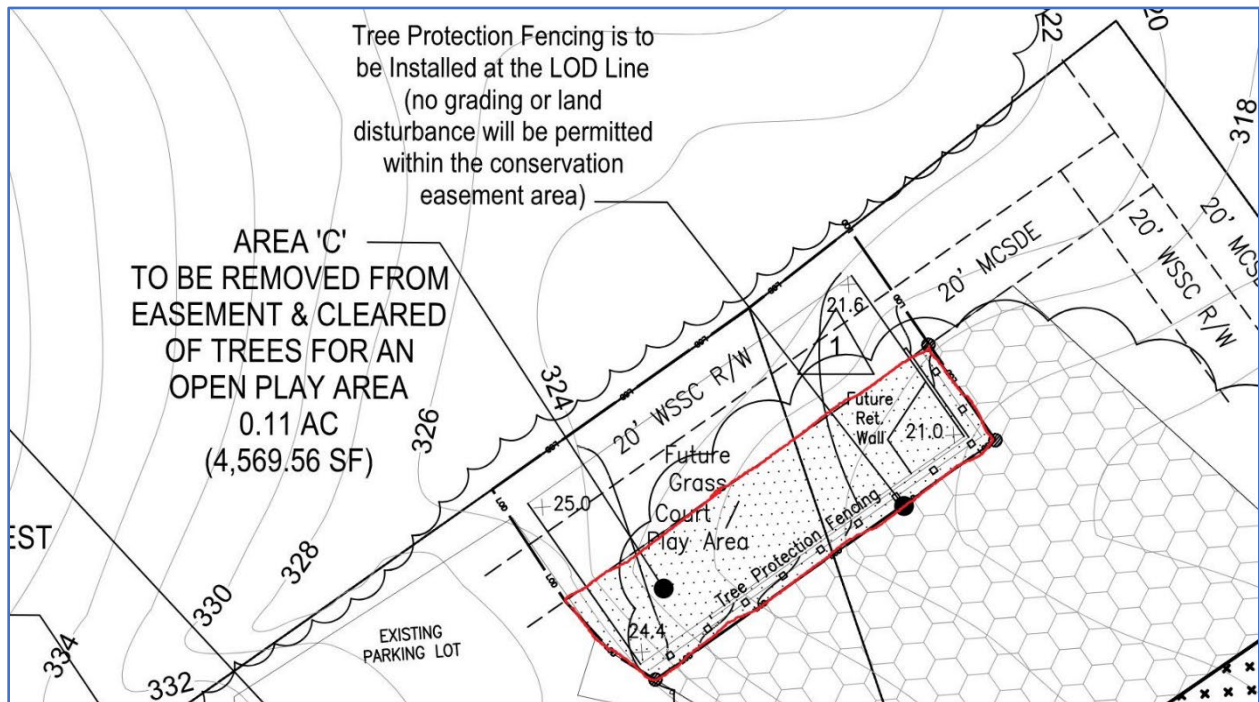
Encroachments of Hardscapes and Driveway into Category I Conservation Easement
